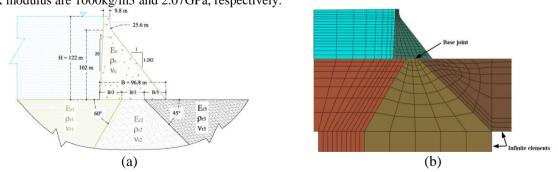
(a) Pine Flat dam with full reservoir and illustrative inhomogeneous foundation, (b) finite element mesh of the dam-reservoir-inhomogeneous foundation system.
